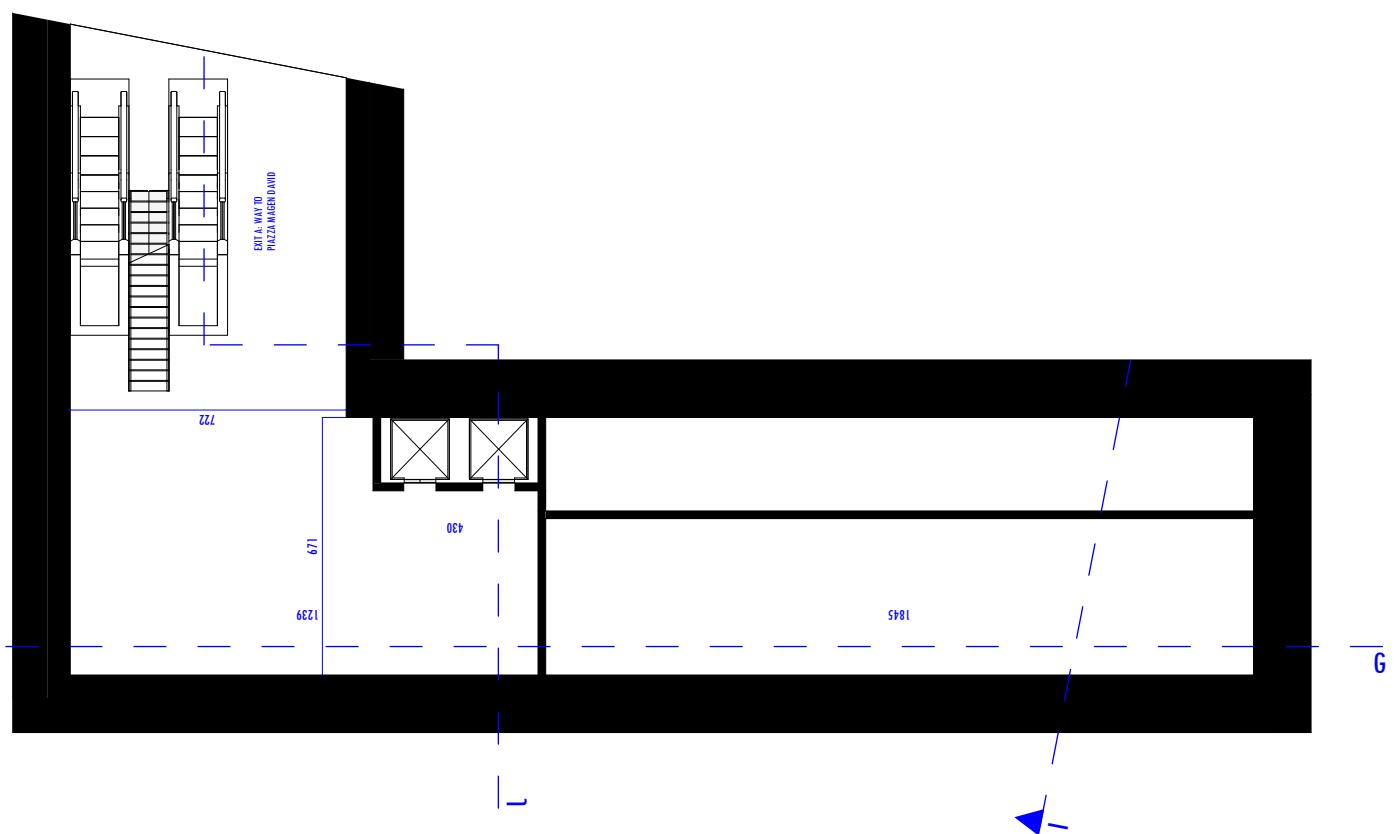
Ticketing floor - Exit A to Piazza Magen David (-9.44m)
